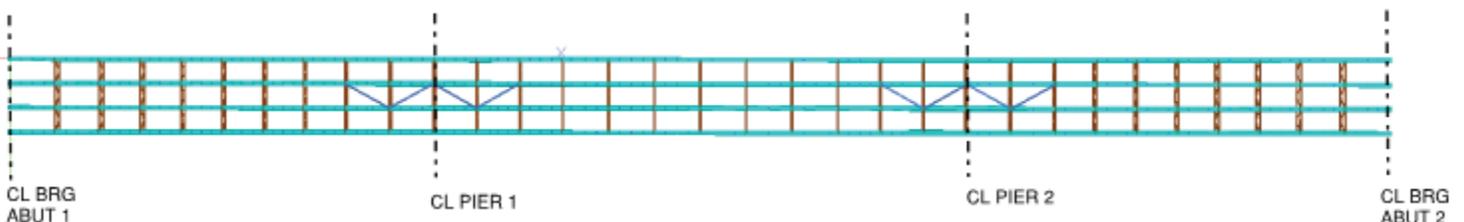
Steel Framing Plan Showing Limited Lateral Bracing Near the Piers and No Lateral Bracing at the Abutments. This bridge has a high probability of girder deflection and buckling issues during erection.
